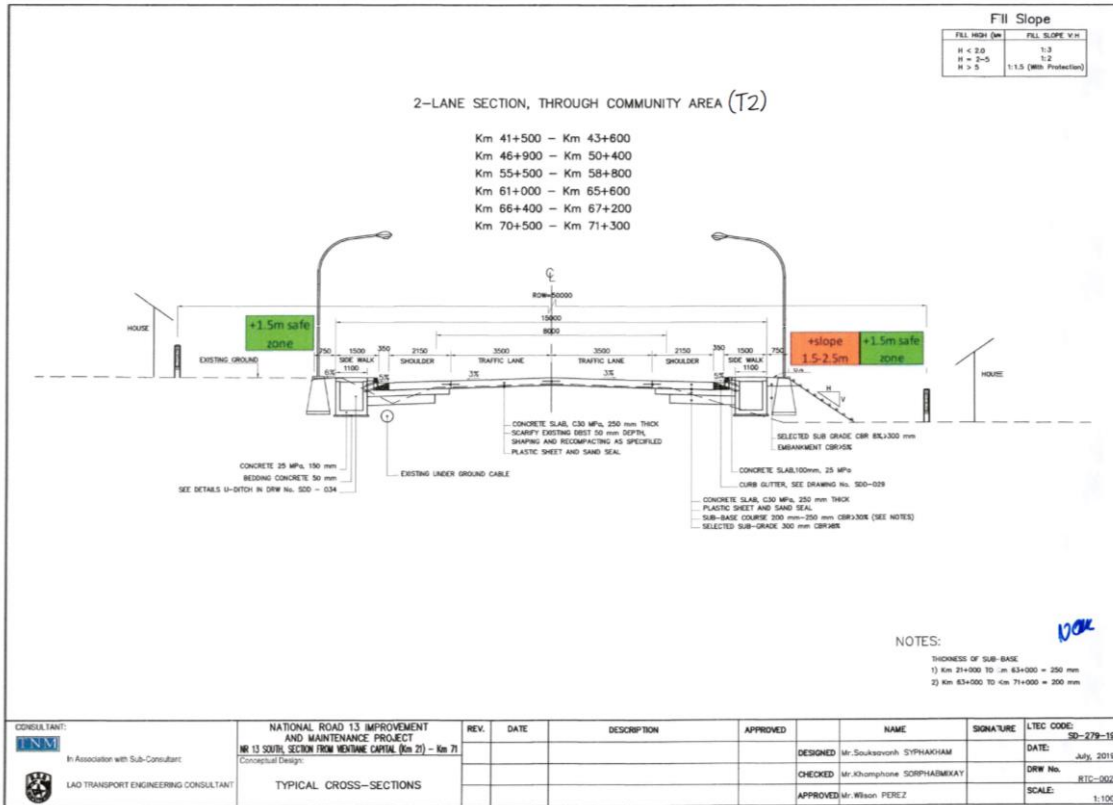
Typical Cross-Sections of 2-Lane Section through Community Area (T2)
